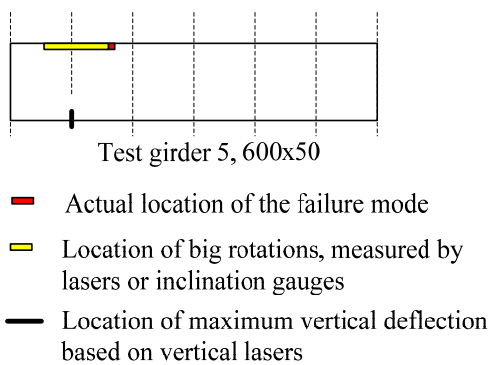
Location of the final failure mode of test girder 5, 600x50
